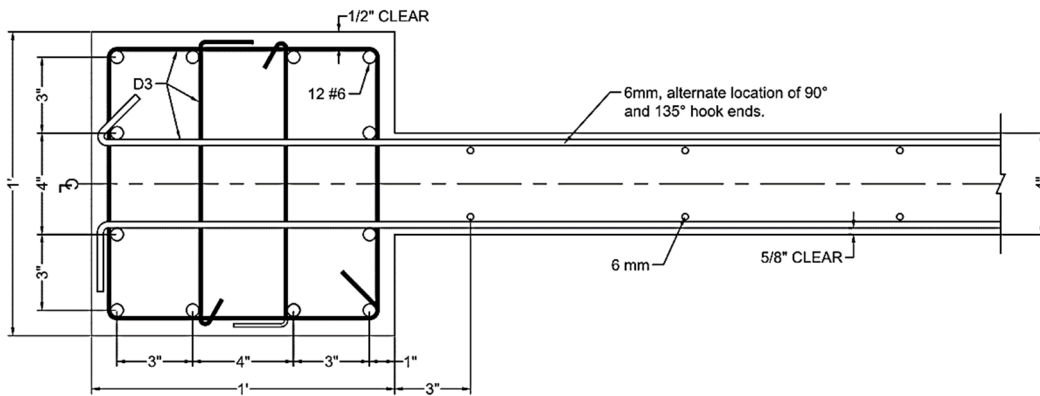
Shear Wall Specimen B6 – Cross Section (Oesterle et al. 1979)
